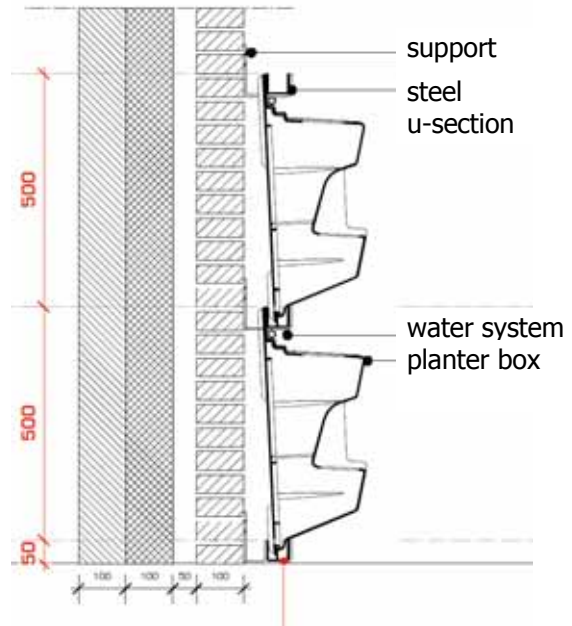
Right; modular living wall system (planter boxes) against the façade with closed edges to ensure a stagnant air layer between modules and façade.
